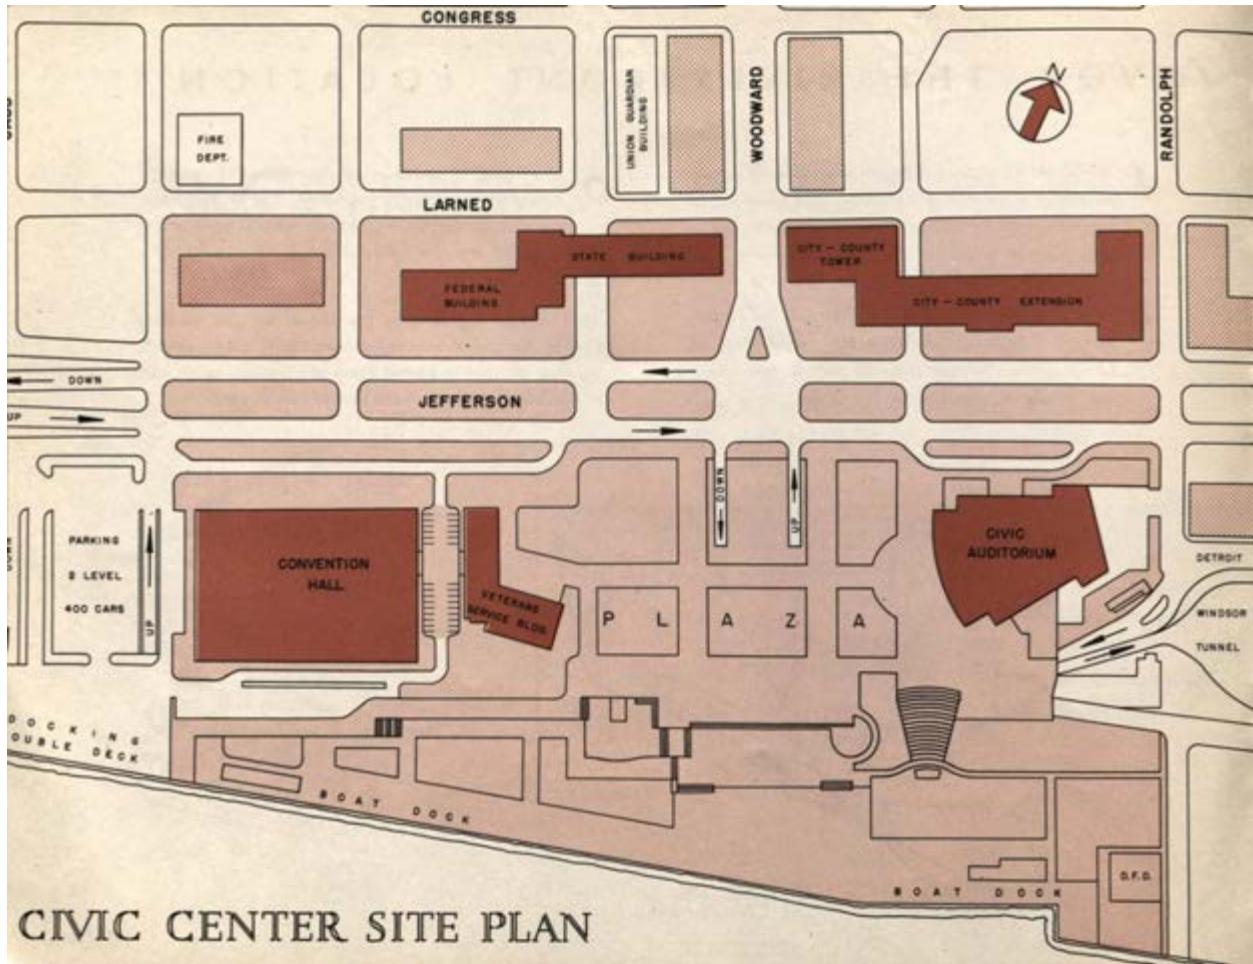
Suren Pilafian, preliminary studies; City Plan Commission, final design; Detroit Civic Center plan, 1946. City Plan Commission [Detroit]. *The Civic Center Plan* [*City of Detroit – A Master Plan Report, No. 3 of a Series*], (Detroit: October 1946), p. 12. Library of Congress.
